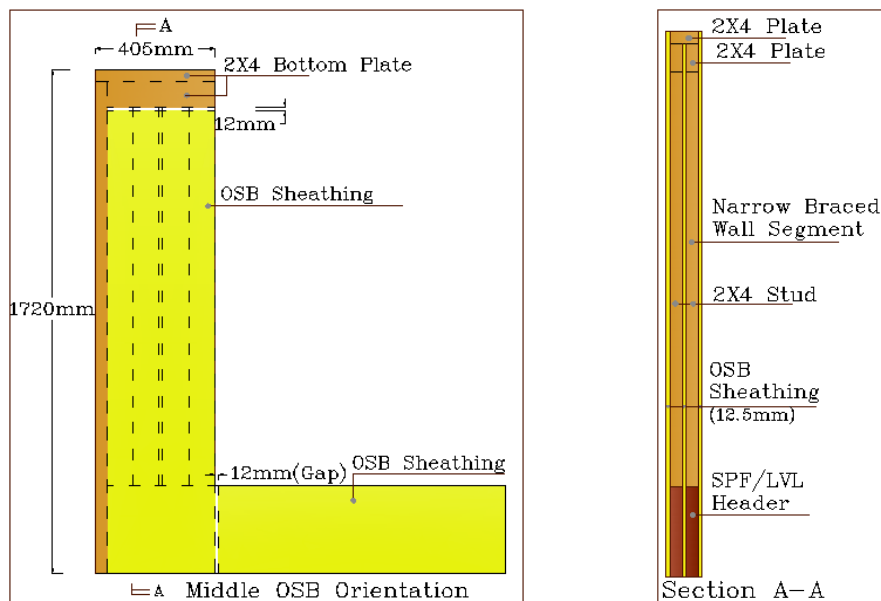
Elevation and cross section of MIDPLY portal frame corner joint
